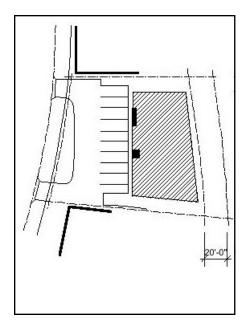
Unacceptable: Site plan for a typical unacceptable commercial development that has no relationship to the sidewalk or street.
